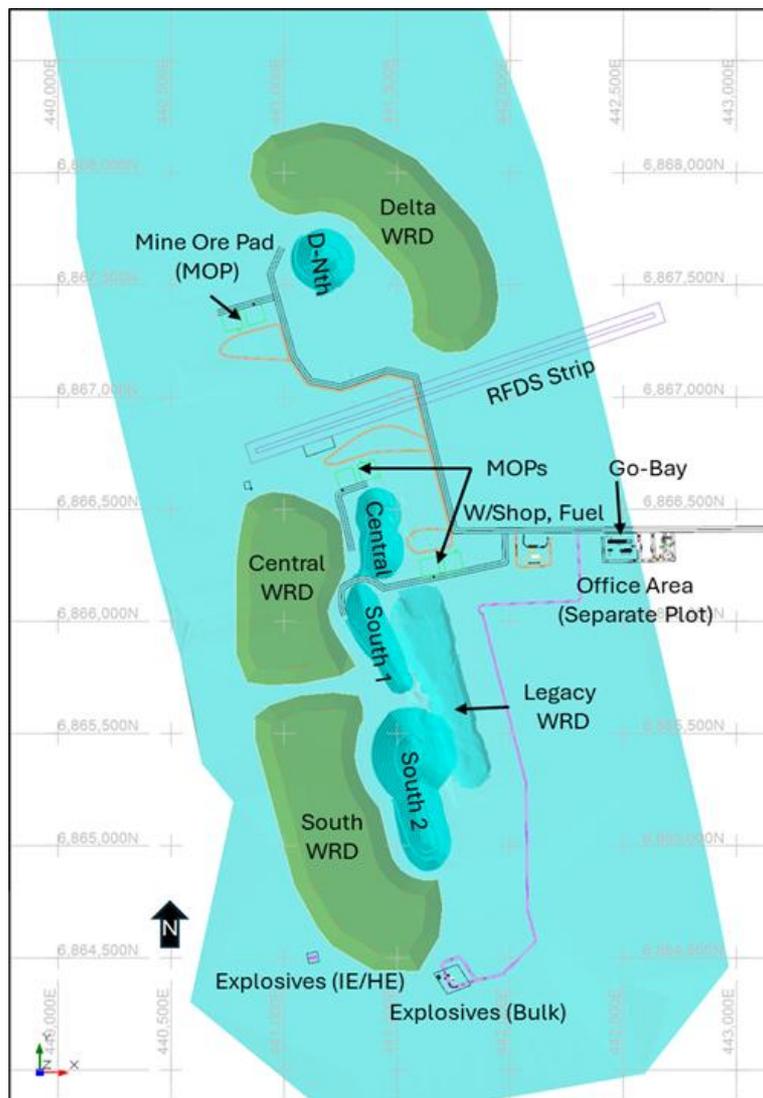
Plan view – Cork Tree Well pits with associated infrastructure
